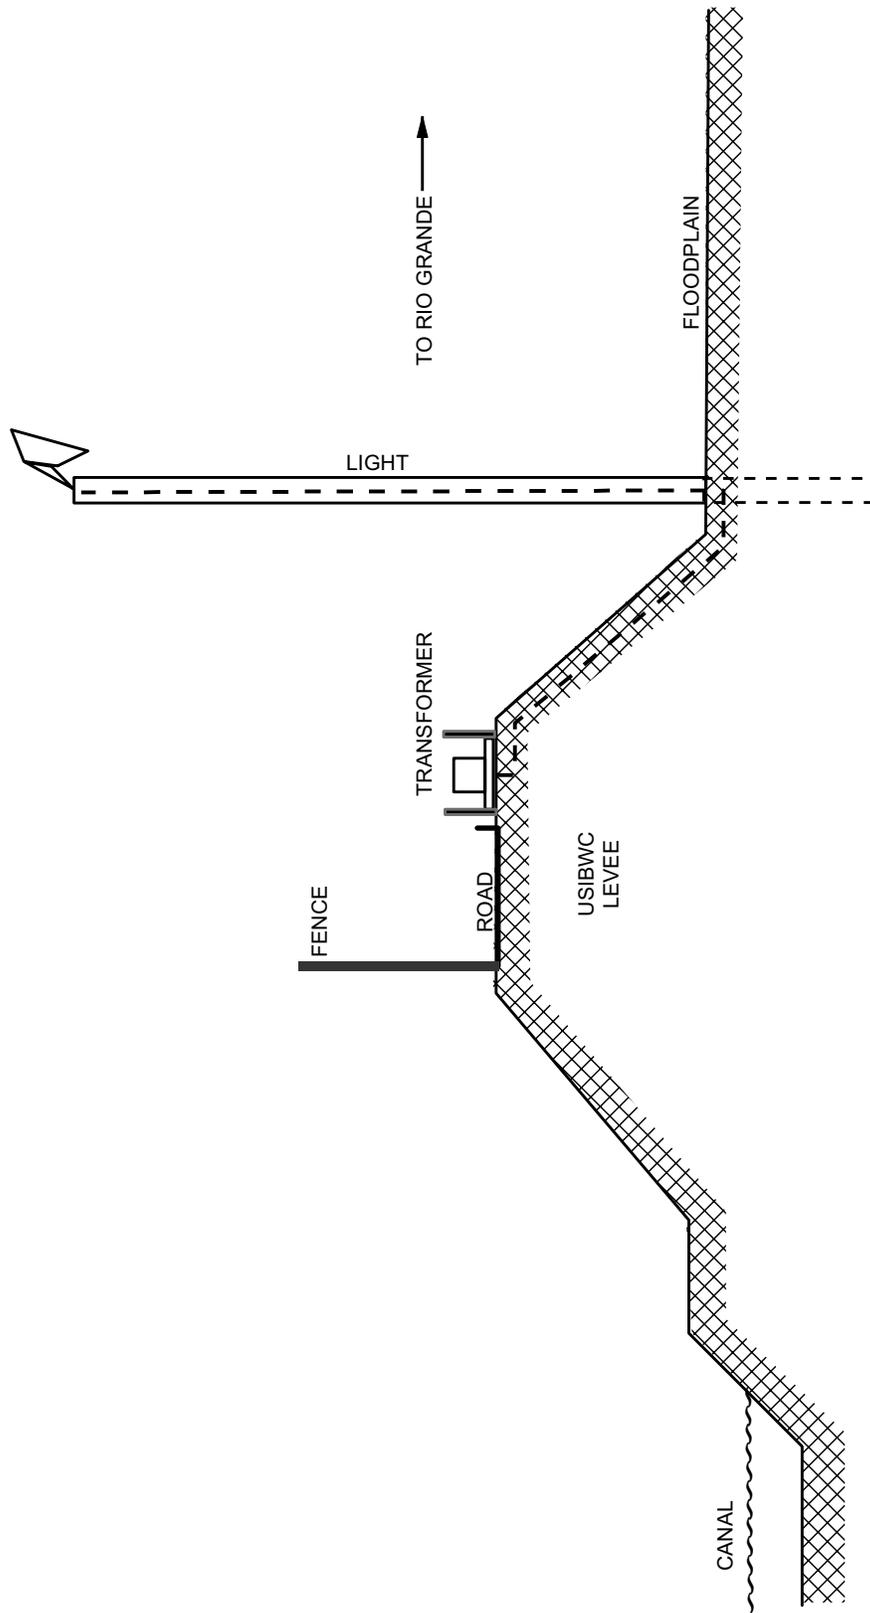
Typical Schematic Cross Section, Floating Foundation Fence Design
